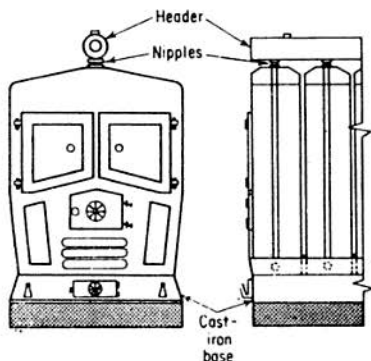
Vertical-sectional horizontal-stacked cast-iron boiler of the screwed-nipple type.
